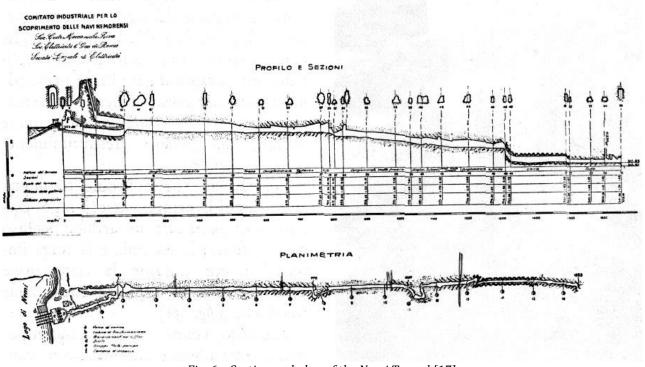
Section and plan of the Nemi Tunnel [17].
